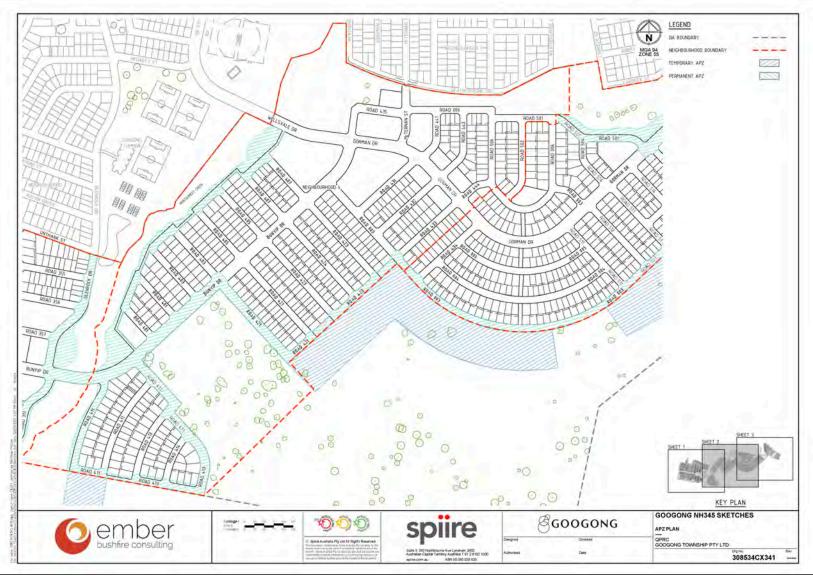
APZ plan for NH 2. (Ember & Spiire, 2021)
